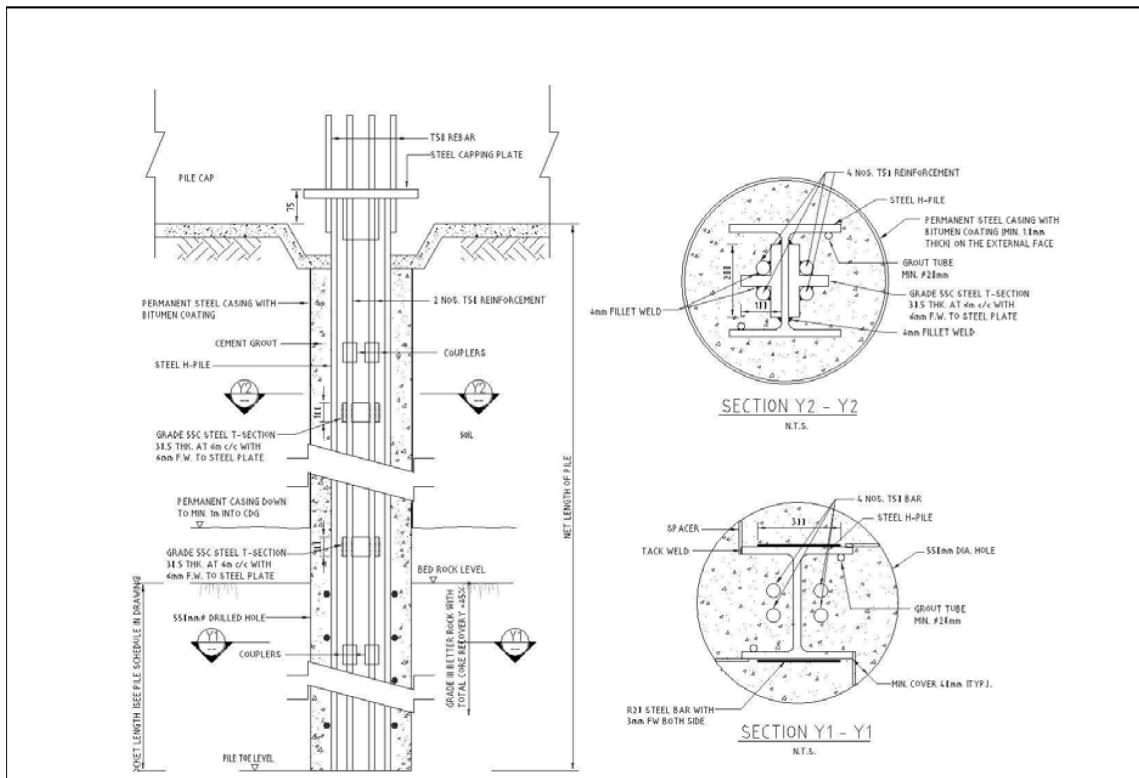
Typical Detail of Rock Socketted H-piles of Alternative Design
